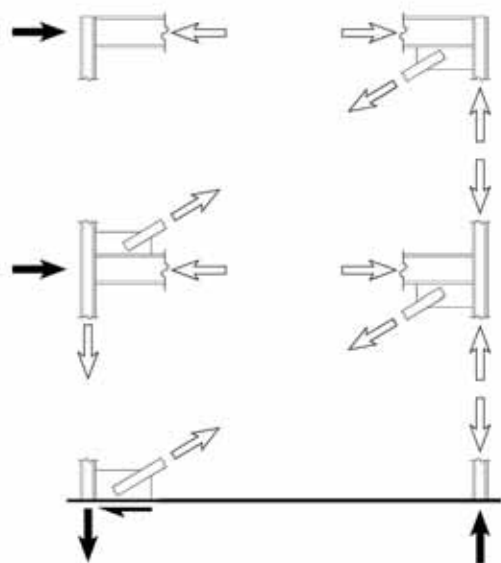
Beam and column forces in tension-only bracing configurations.
